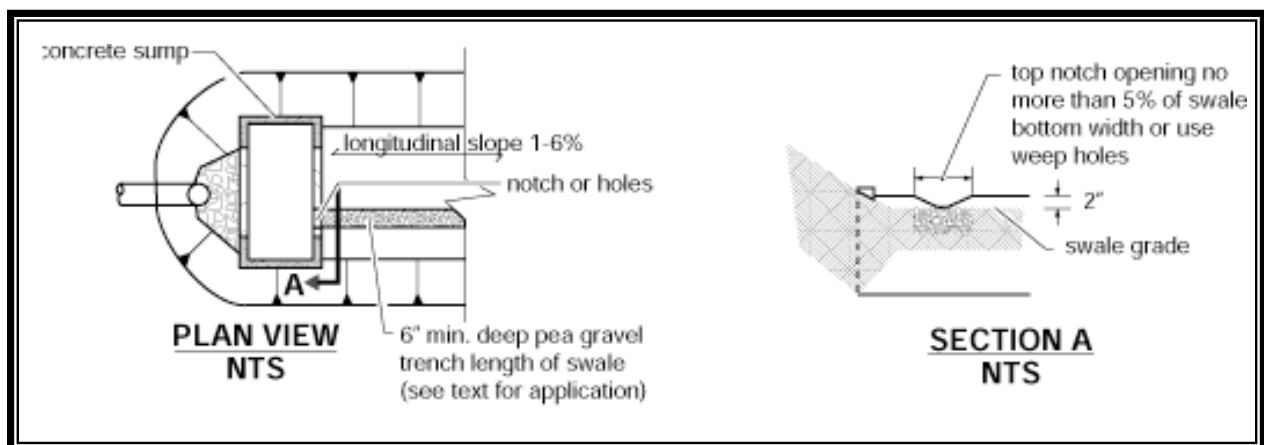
Biofiltration Swale Low-Flow Drain Detail.
